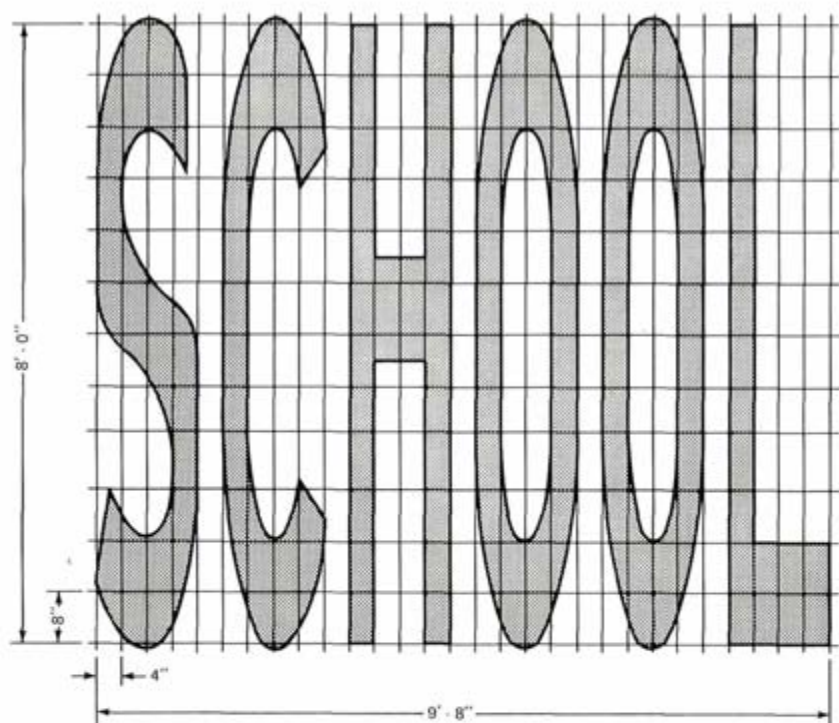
Single-lane pavement marking—detail of word "SCHOOL".
